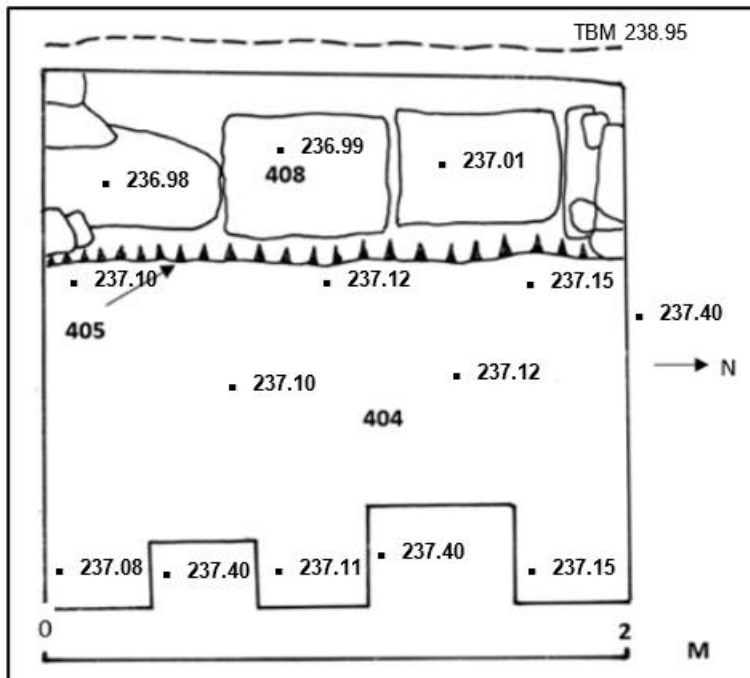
Trench 4. Plan 4. Base of culvert (408) sitting in cut (405), cutting (404).
